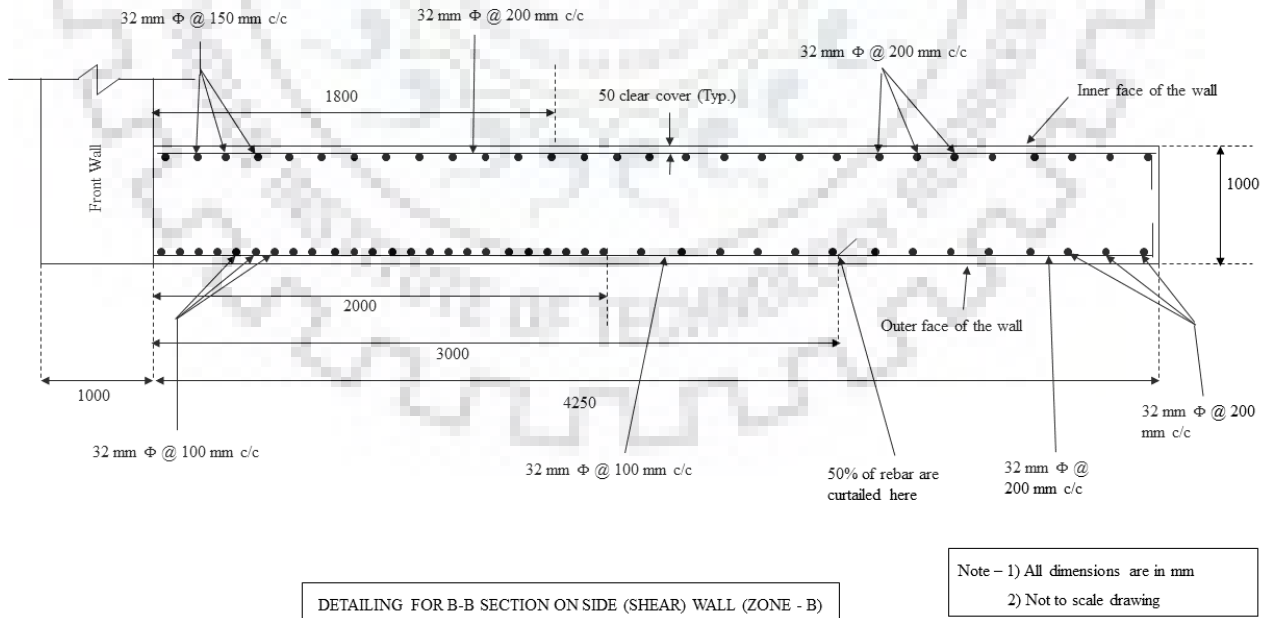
Detailing of Section B–B of shear wall for zone – B
